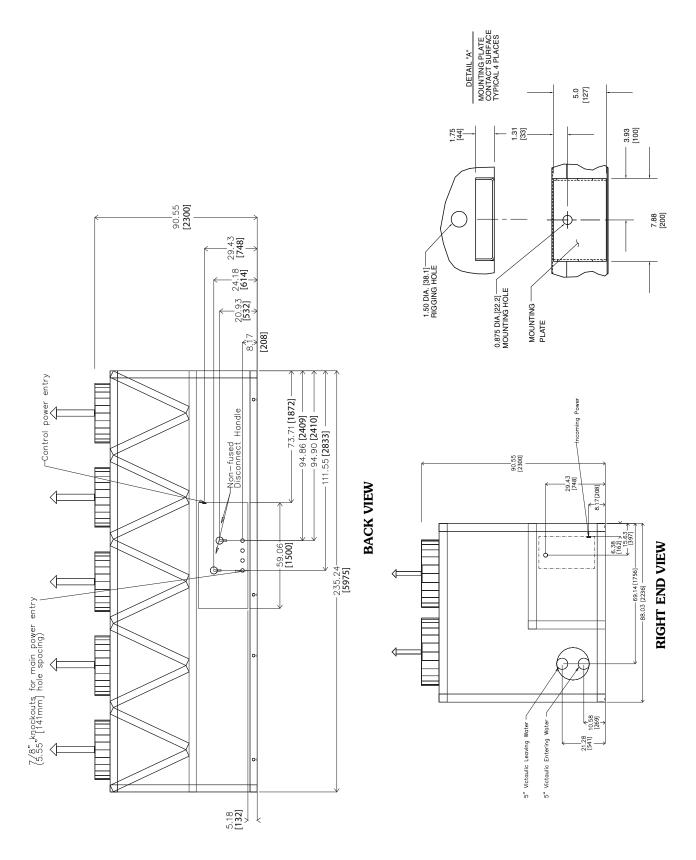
30XA140,160 Air-Cooled Liquid Chiller without Pump Dimensions (cont)
